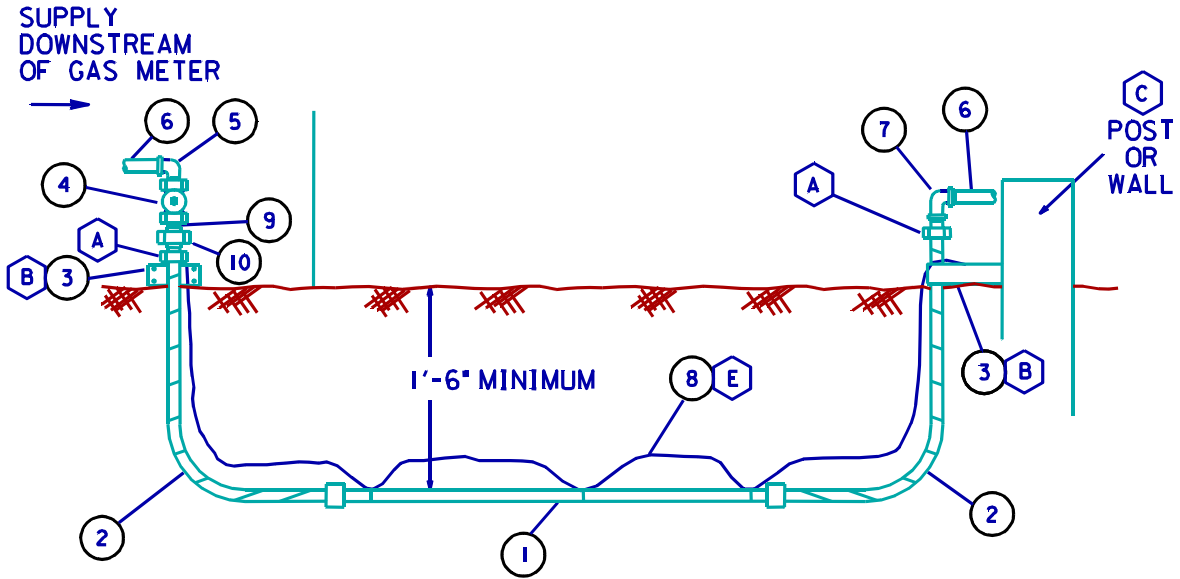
EXHIBIT BTYPICAL UNDERGROUND PLASTIC HOUSE PIPING INSTALLATION
